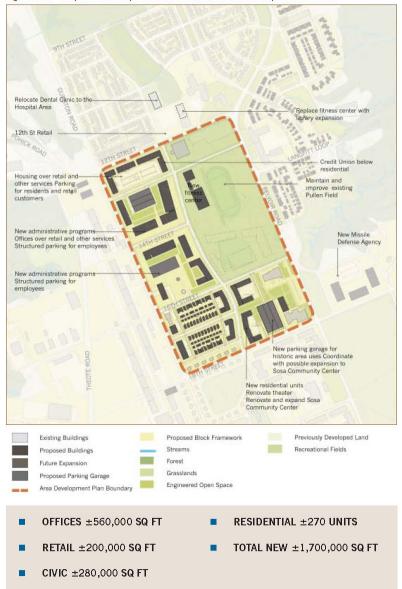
Proposed Development Plan for the FBNA as presented in ADP
